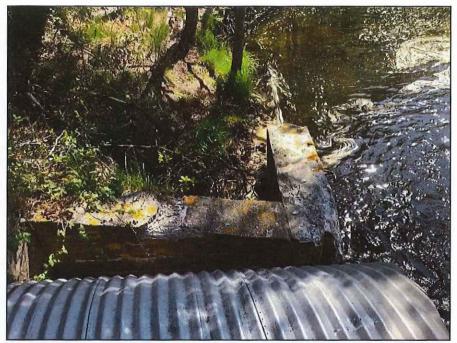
Left downstream concrete wall. Note concrete spalling and delamination typical of the downstream headwall.
